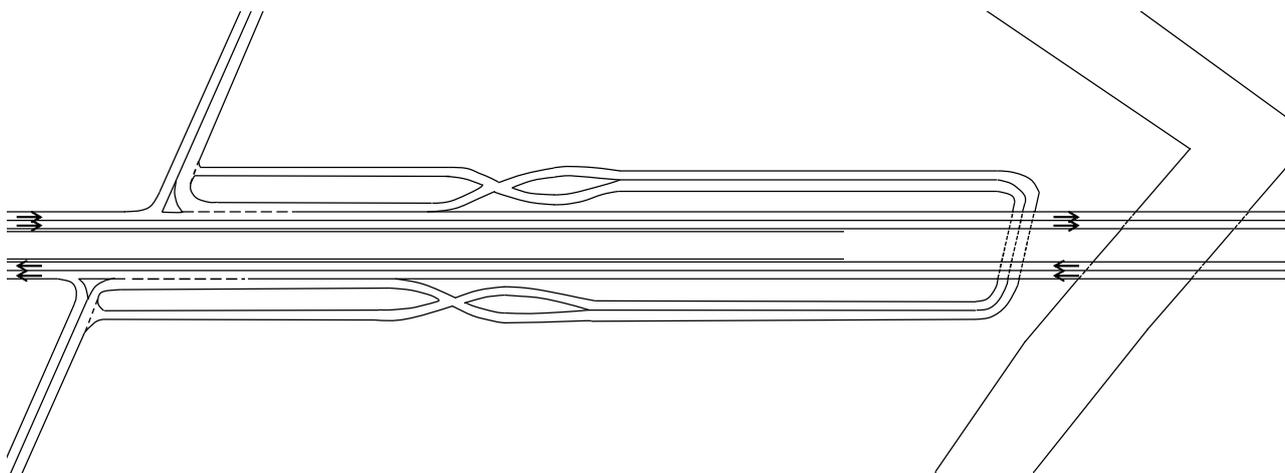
(A)(B) Extension of parallel road connected with underpass U-turn
